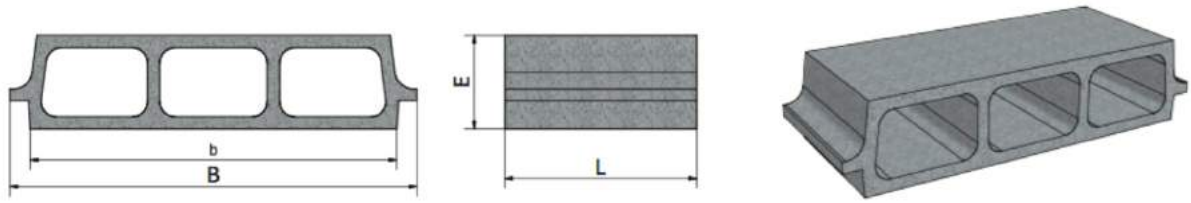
Illustration of a slab used for the girder - slab system. [76]
